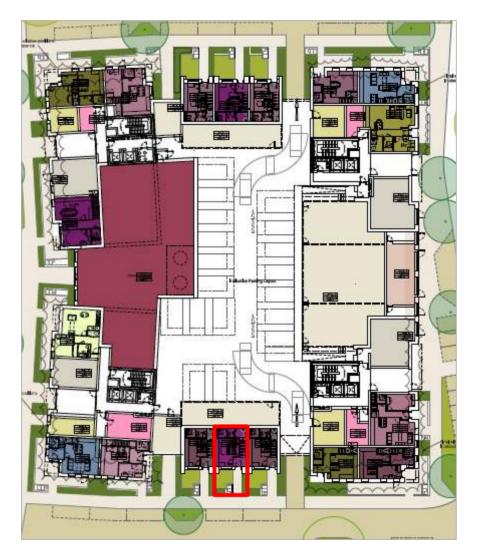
Block E, ground floor level selected Maisonette facing south (Patel Taylor drawings 21.09.2020).
